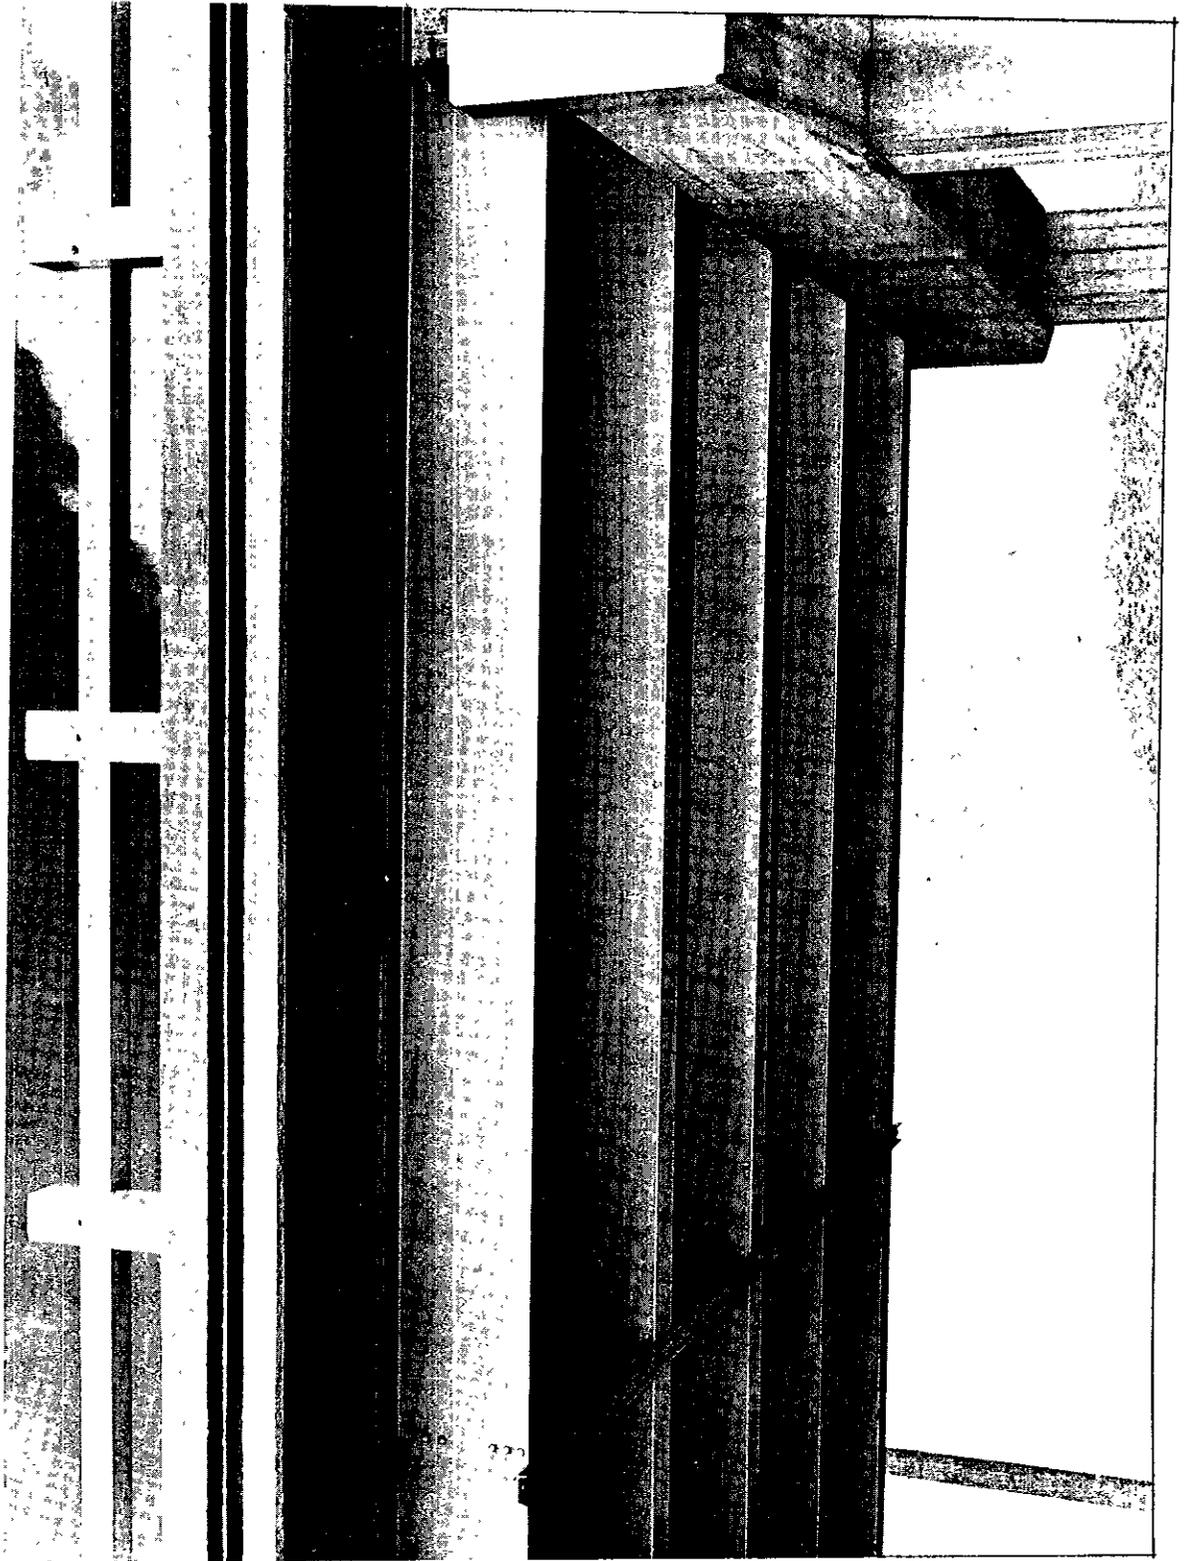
Leffingwell Creek Bridge. Span 4, South Section
